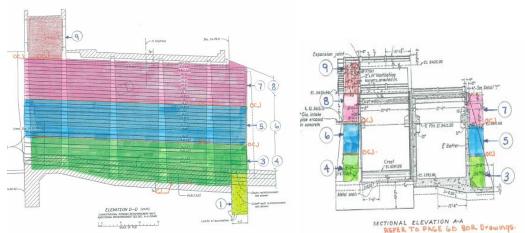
RSMC seismic buttress contractors concrete placement plan, elevation (left), section (right), placement numbers circled. Deer Creek Dam Spillway Modification.
